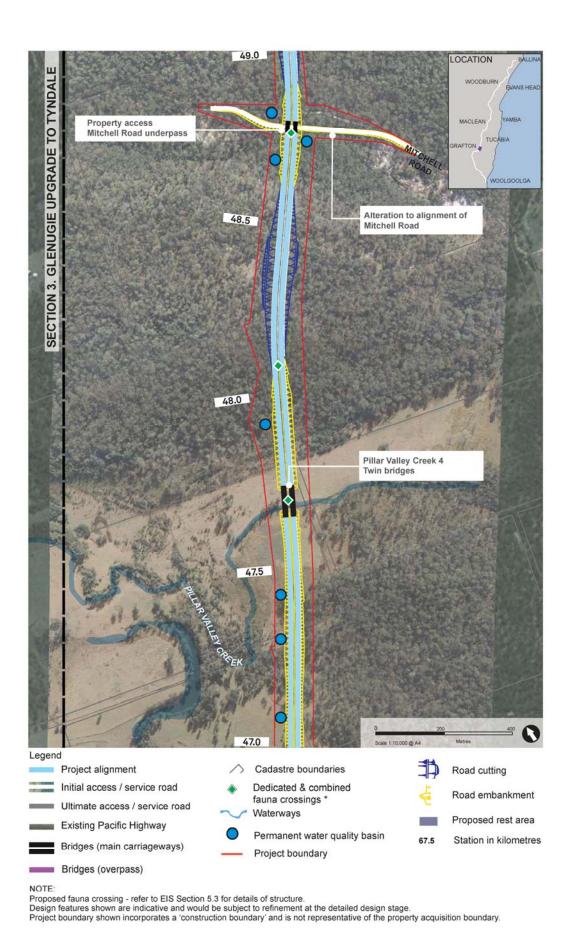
The project - Section 3 (Station 47.0 to 49.0)
